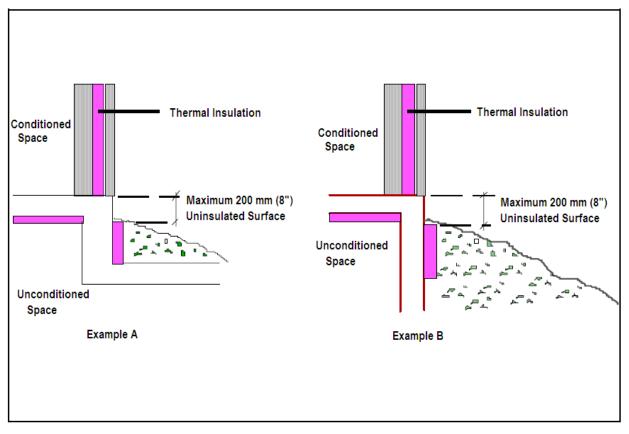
Maximum Uninsulated Surface of Foundation Wall
